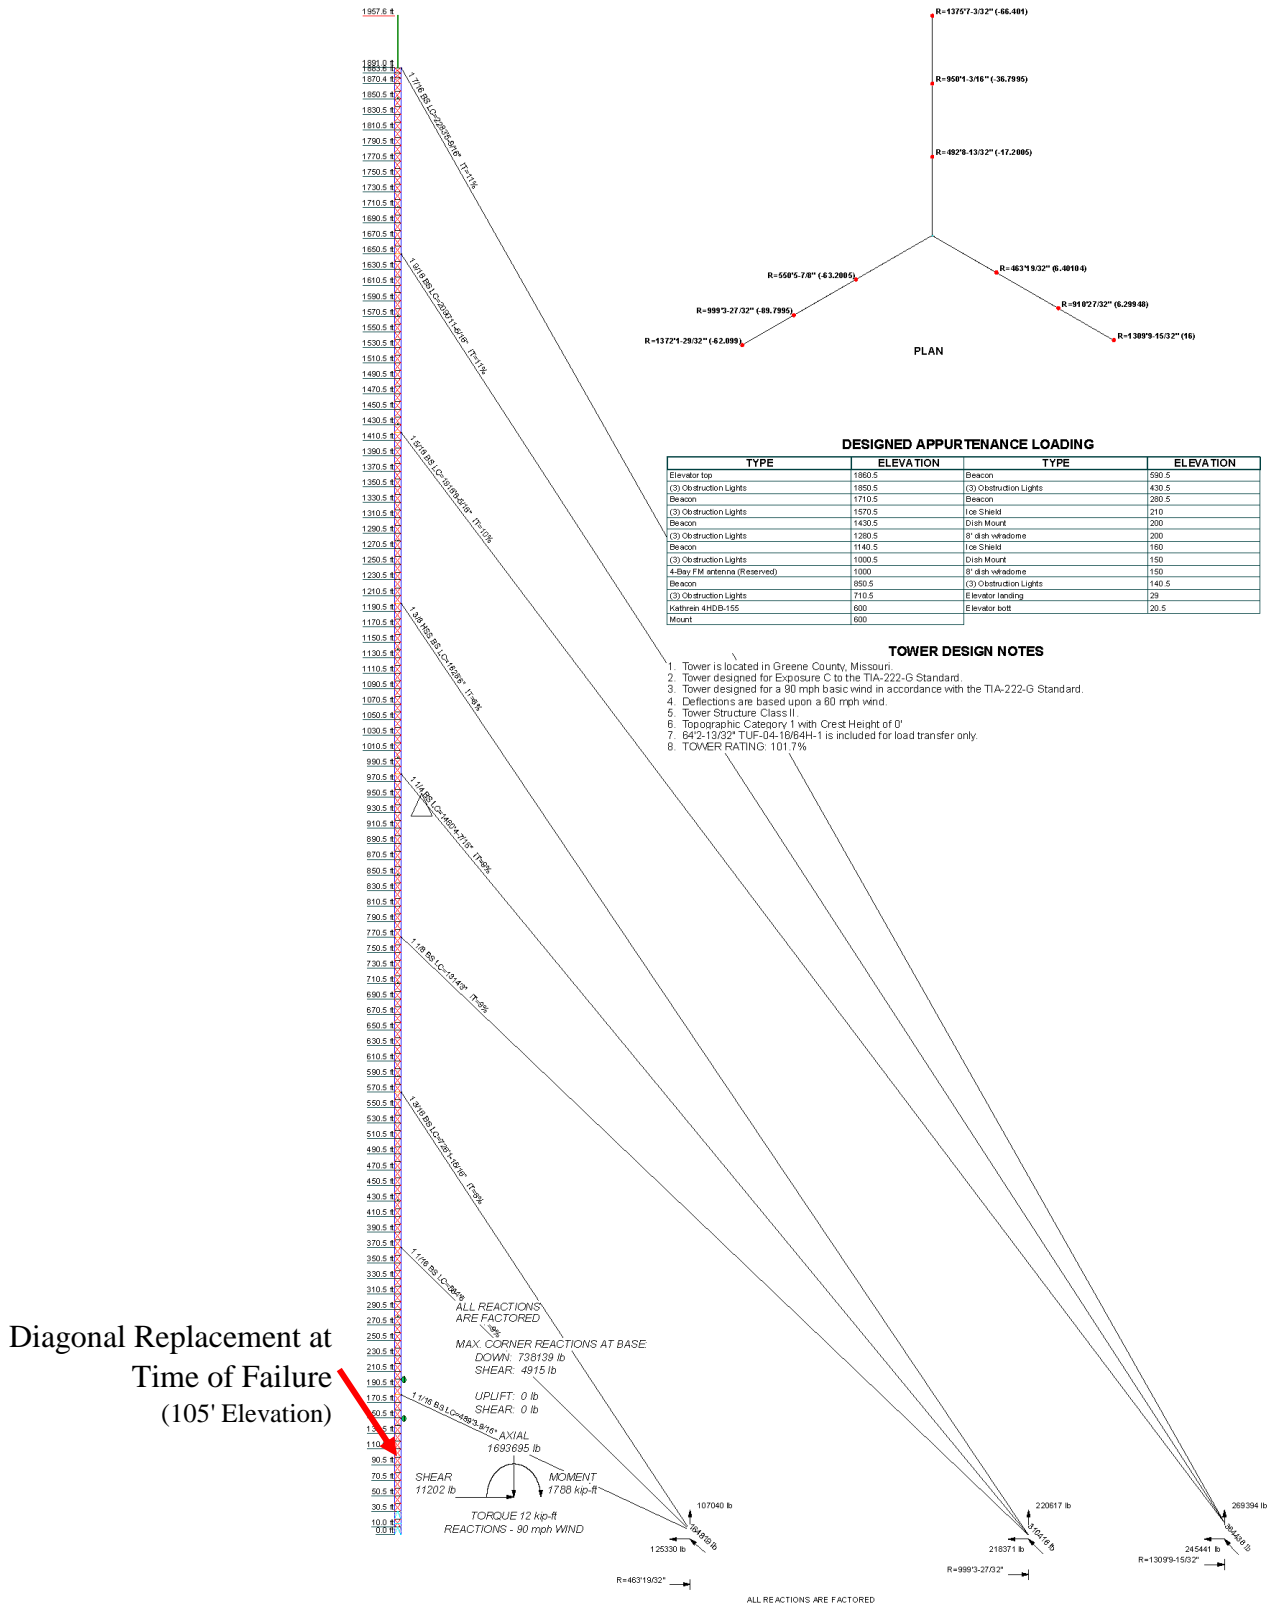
Tower Elevation (TCI Structural Analysis Report Appendix E-1)
